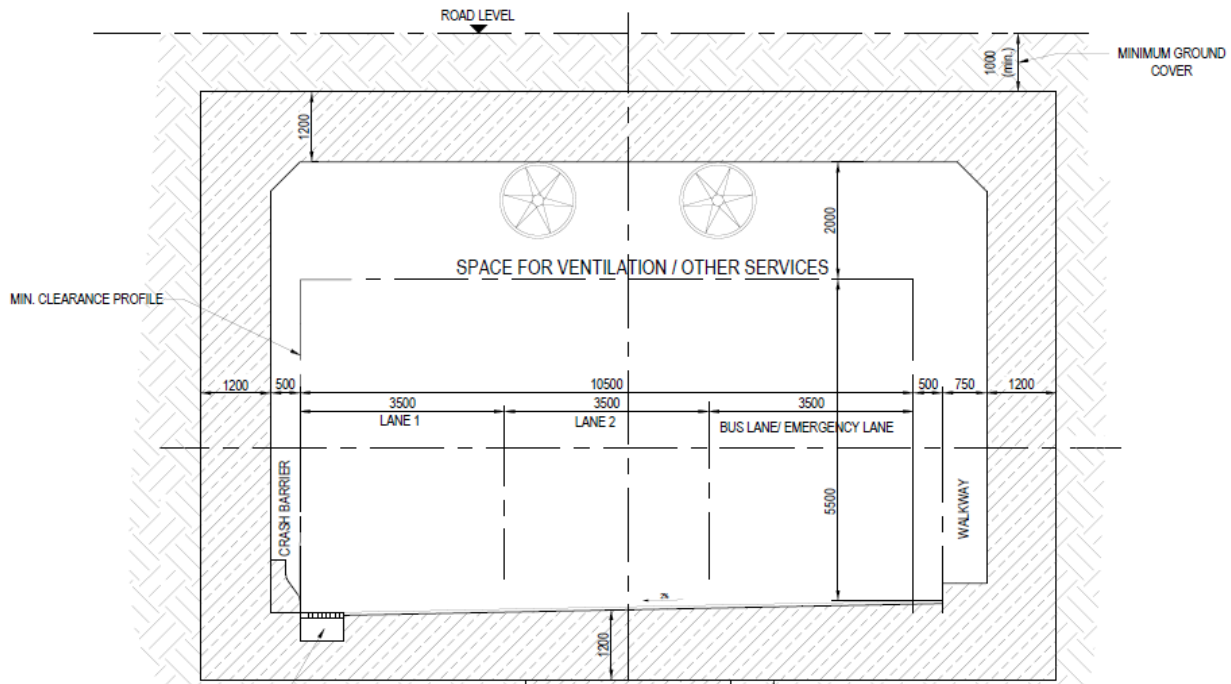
Typical Cross Section C&C Structure (3 LANE)
